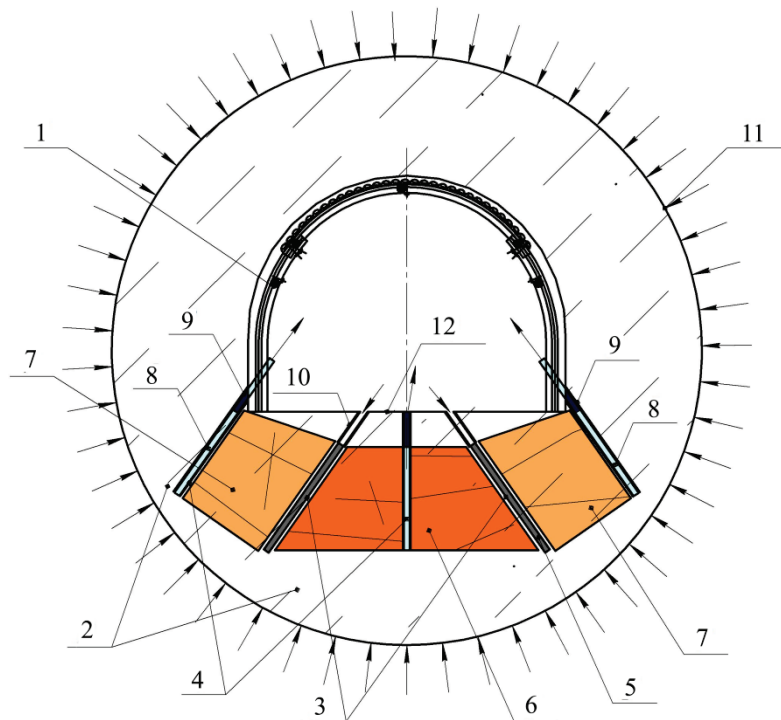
Method of local floor reinforcing [20]: 1 – roadway, 2 – boundary rocks, 3, 4 – wells, 5 – bonding solution, 6 – central locally reinforced zone, 7 – lateral locally reinforced zones, 8 – steel pipes, 9 – packers, 10 – casing pipes, 11 – zone of inelastic deformations, 12 – roadway floor.
